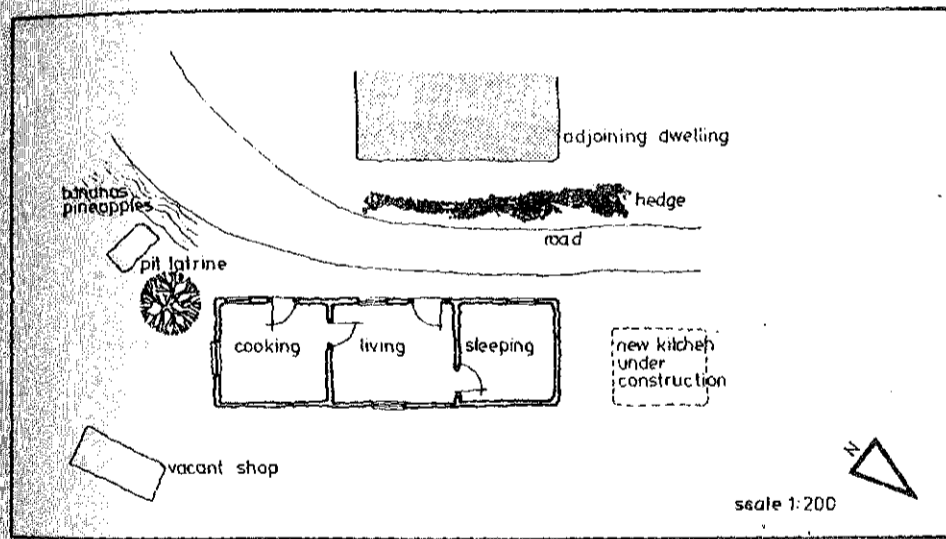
LINEAR DWELLING WITH EXTERNAL AND INTERNAL DOOR ACCESS
